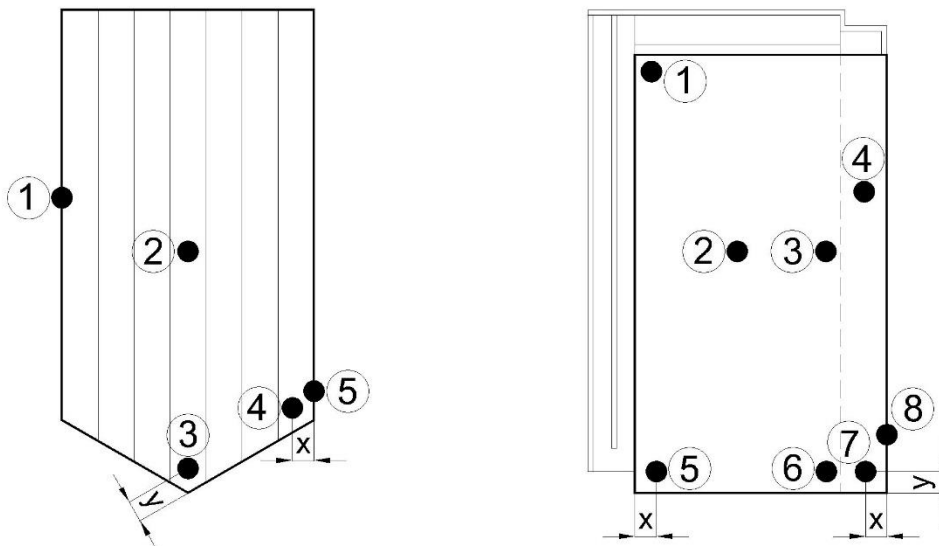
Target areas in ground plan for non-interlocking clay roof tiles and concrete roof tiles (left) and interlocking roof tiles (right), $x = y$: $1/5$ projectile diameter
